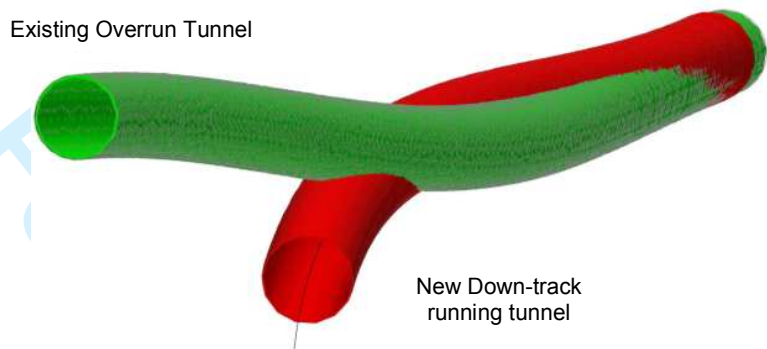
Geometry of new tunnel connection to existing Overrun Tunnel
